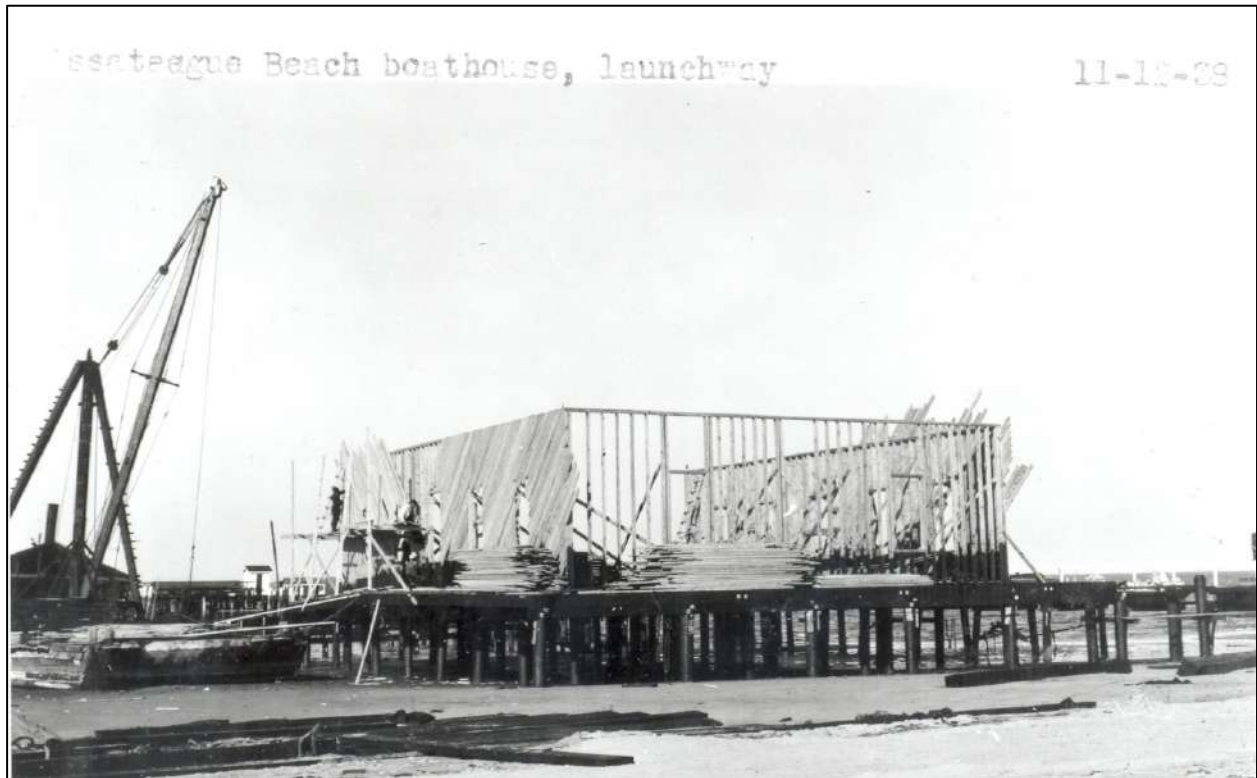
Assateague Beach Boathouse: Construction view, looking northeast (November 12, 1938).
